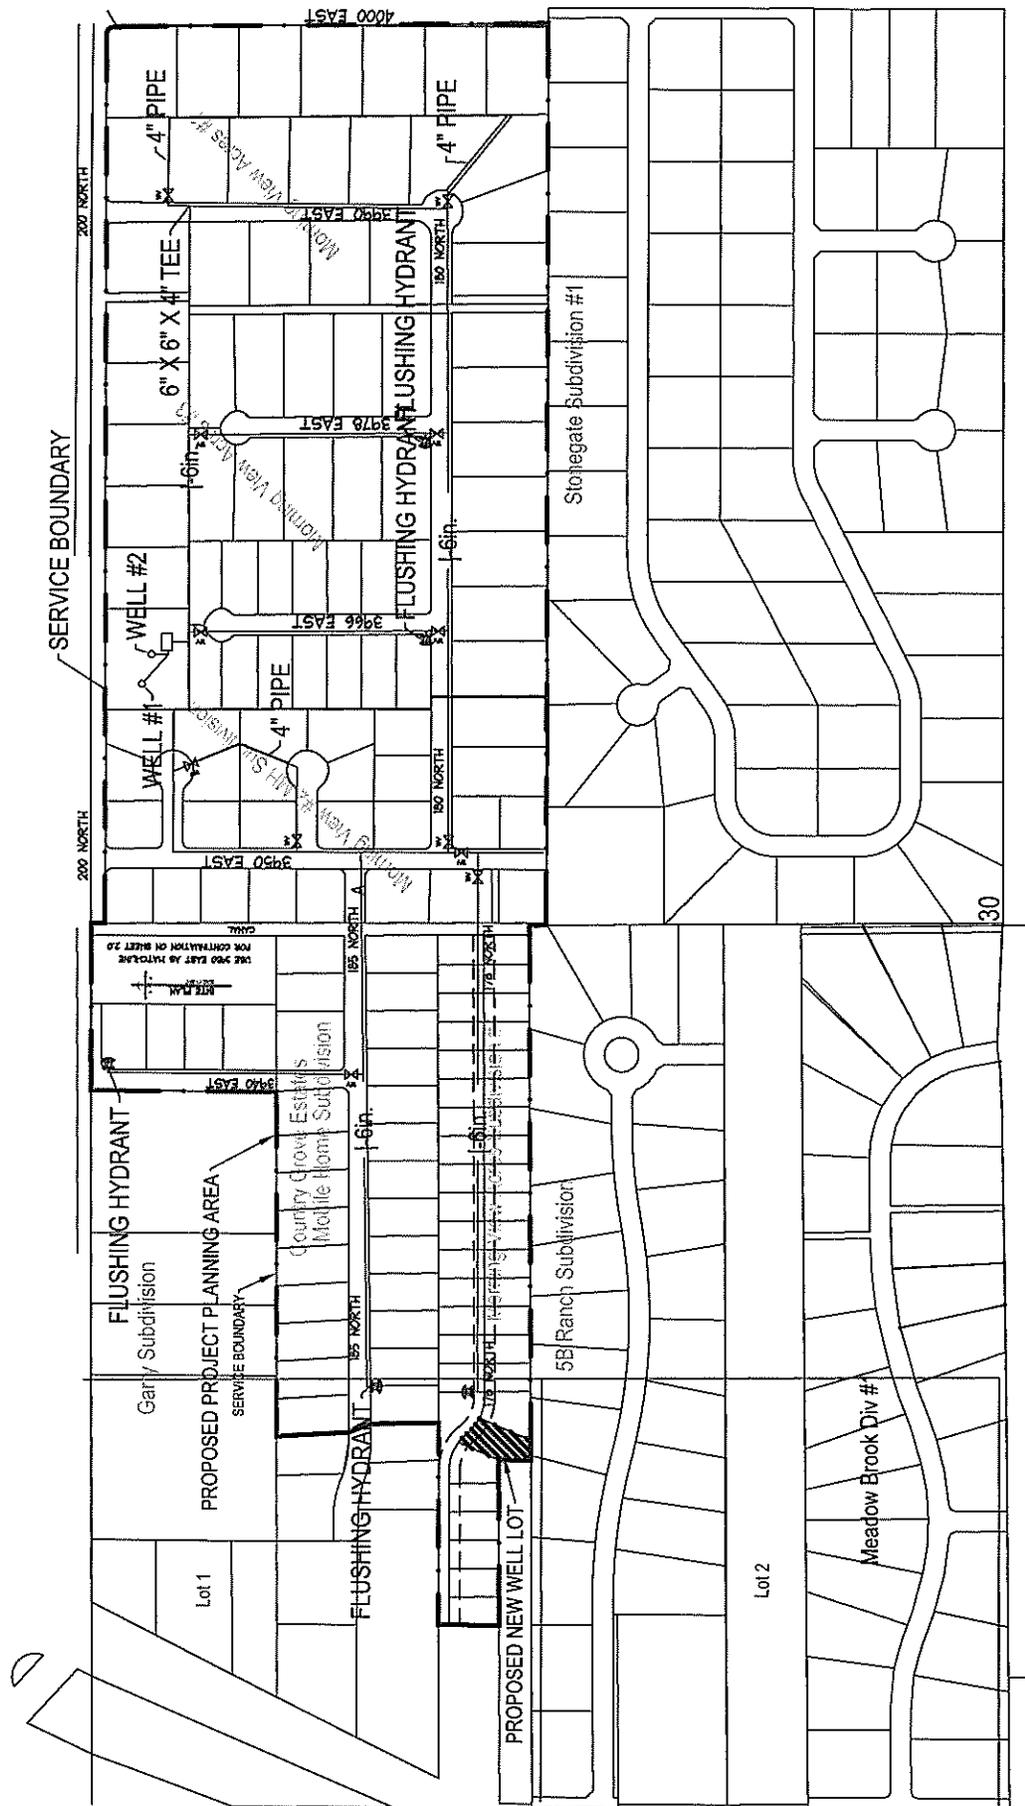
PROPOSED PROJECT PLANNING AREA AND NEW WELL LOT LOCATION
